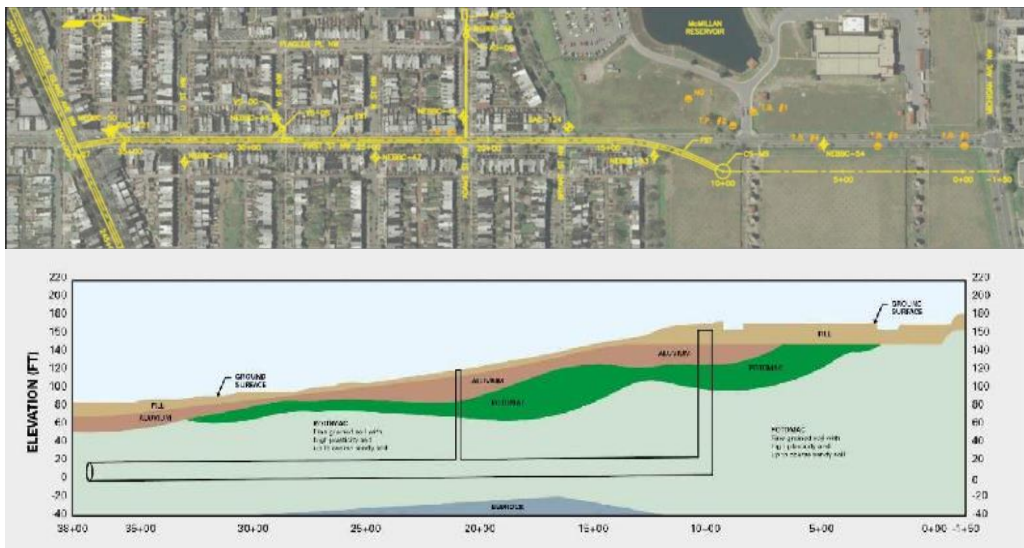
Layout Plan TBM tunnel and geological longitudinal section
